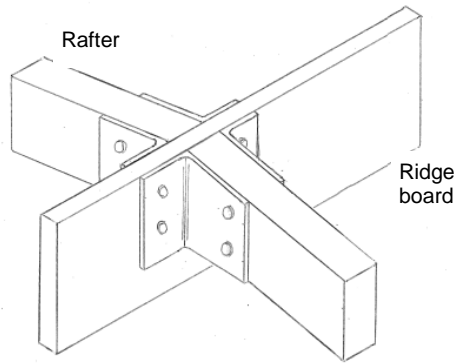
Upgrade C, improvement of connection of rafters at the ridge by installation of 4 No. 100 x 50 x 10 UA brackets with 8 M12 bolts.
